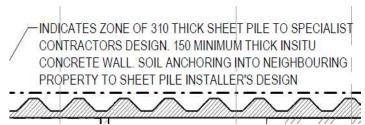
(above) Sheet piling on boundary, with anchoring into adjoining property via "Sheet Pile Installer's Design" despite the presence of major services immediately adjacent to this wall
